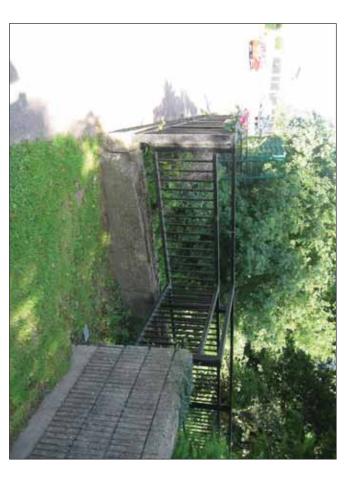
Overgrown area to east of bridge where relief channel will be constructed, looking north
